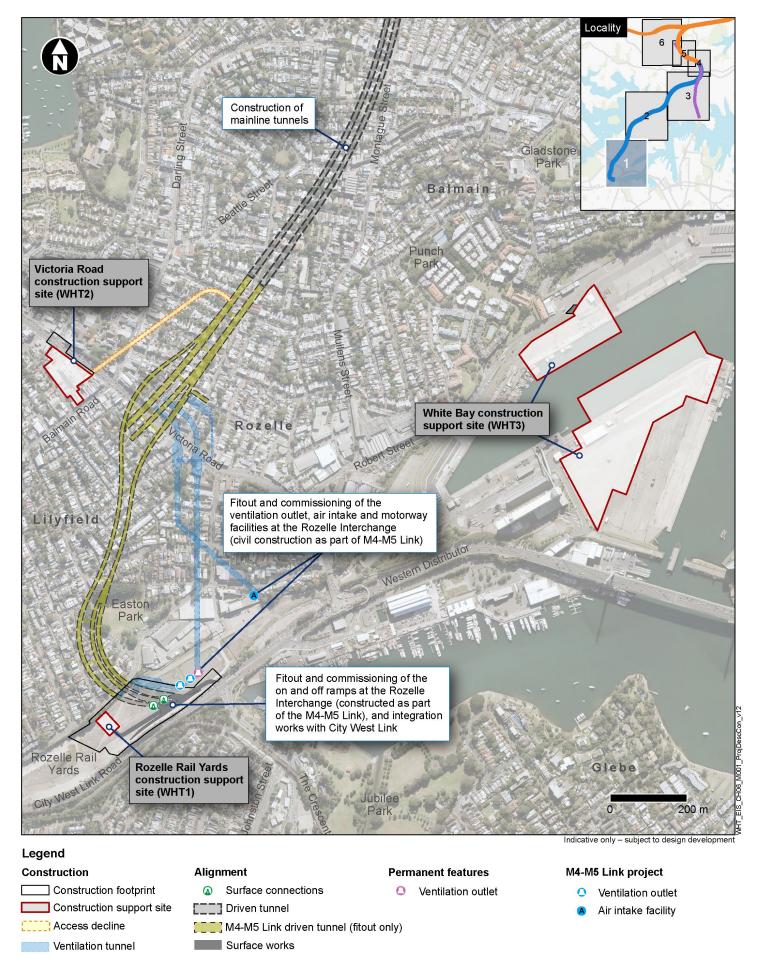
Overview of construction activities and construction footprint (map 1)
